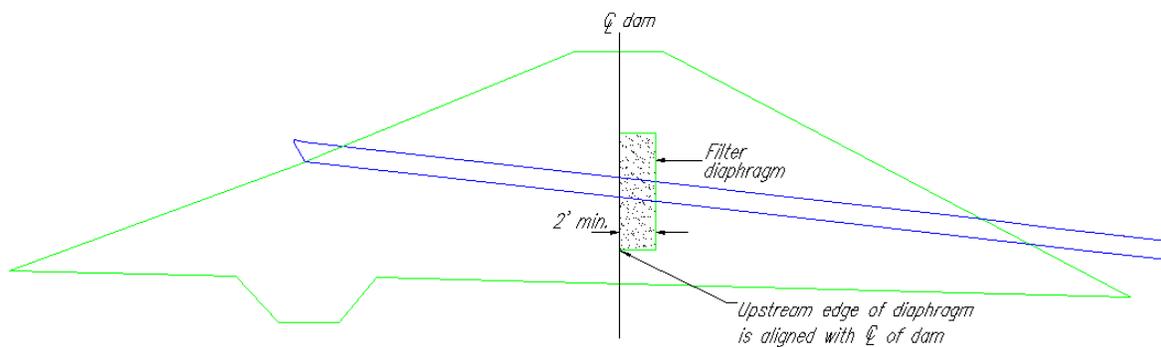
Dimensions for an unlined stilling basinFigure KS11-7 Minimum dimensions for a filter diaphragm section
